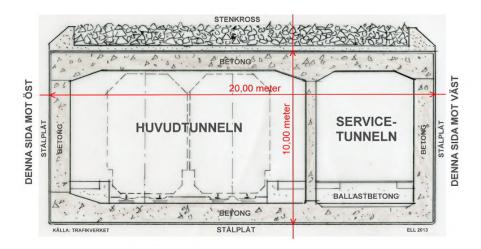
Steel concrete sandwich design used in Söderstrom tunnel (Vliet et al, 2022)
